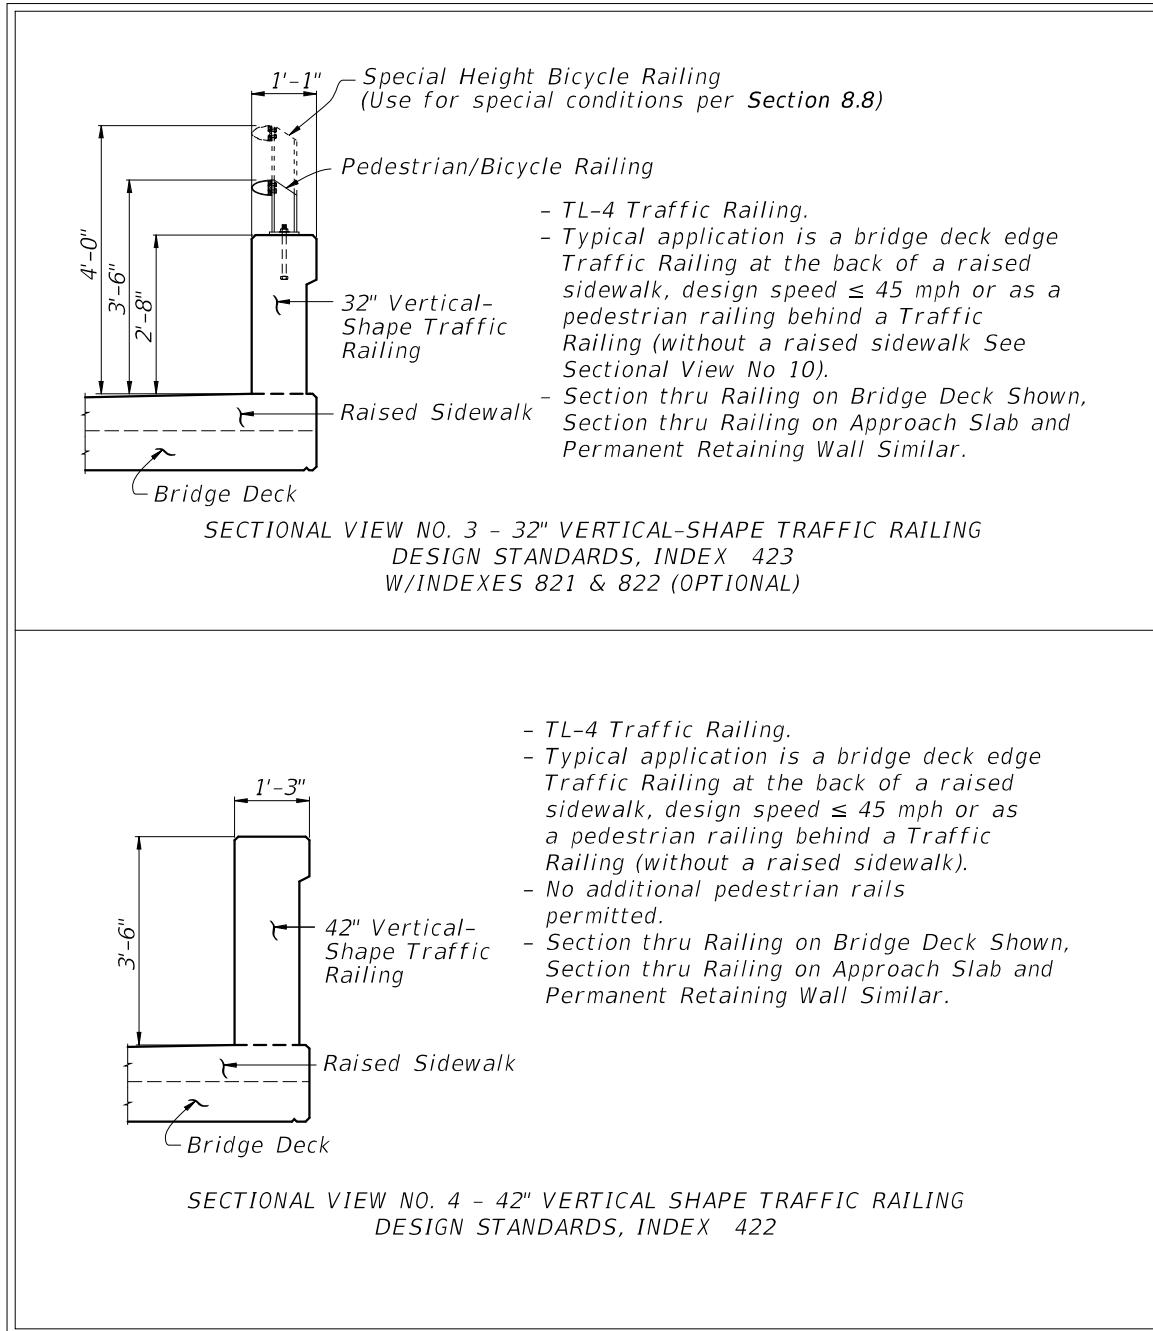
Bridge Traffic Railings – Other Shapes
